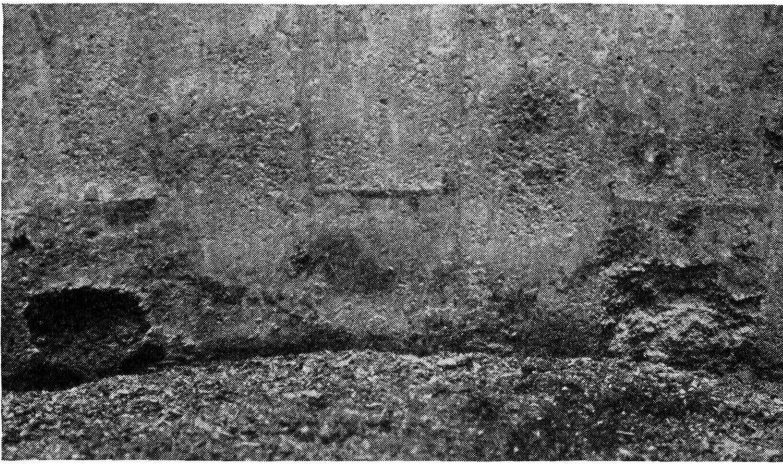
The inside of a concrete silo, showing deterioration of the wall.
